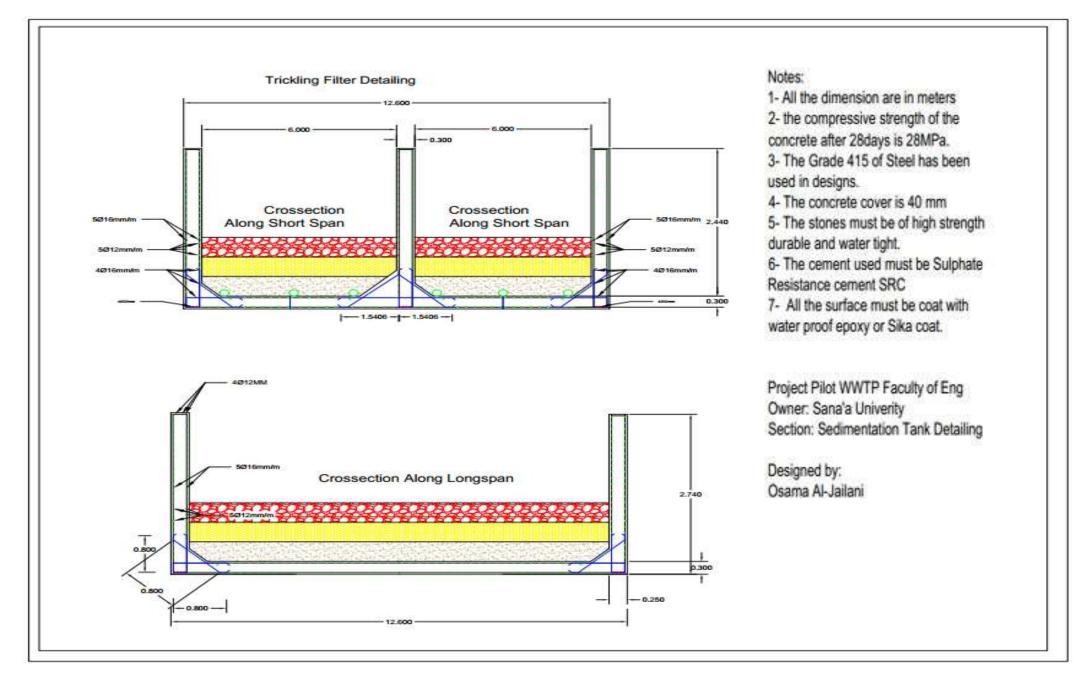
Reinforced Detailing of Trickling Filters Tank for the Proposed WWTP outside the Faculty of Engineering - Source Own Representative
